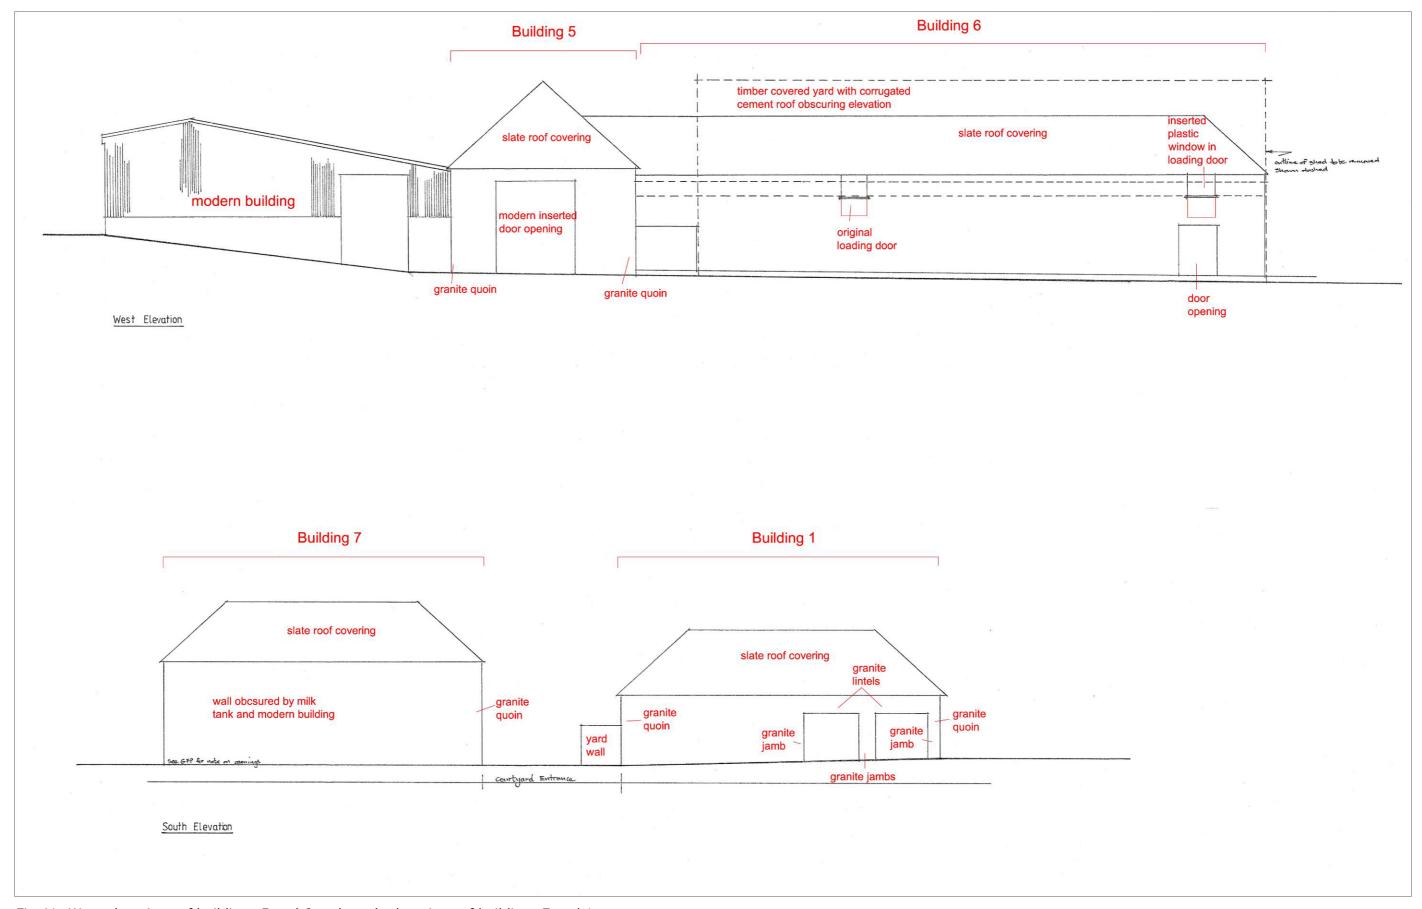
West elevations of buildings 5 and 6 and south elevations of buildings 7 and 1
